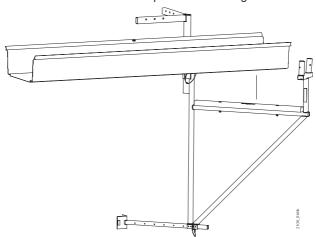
Assembly of Steel Boardwalk on Corner Platform
